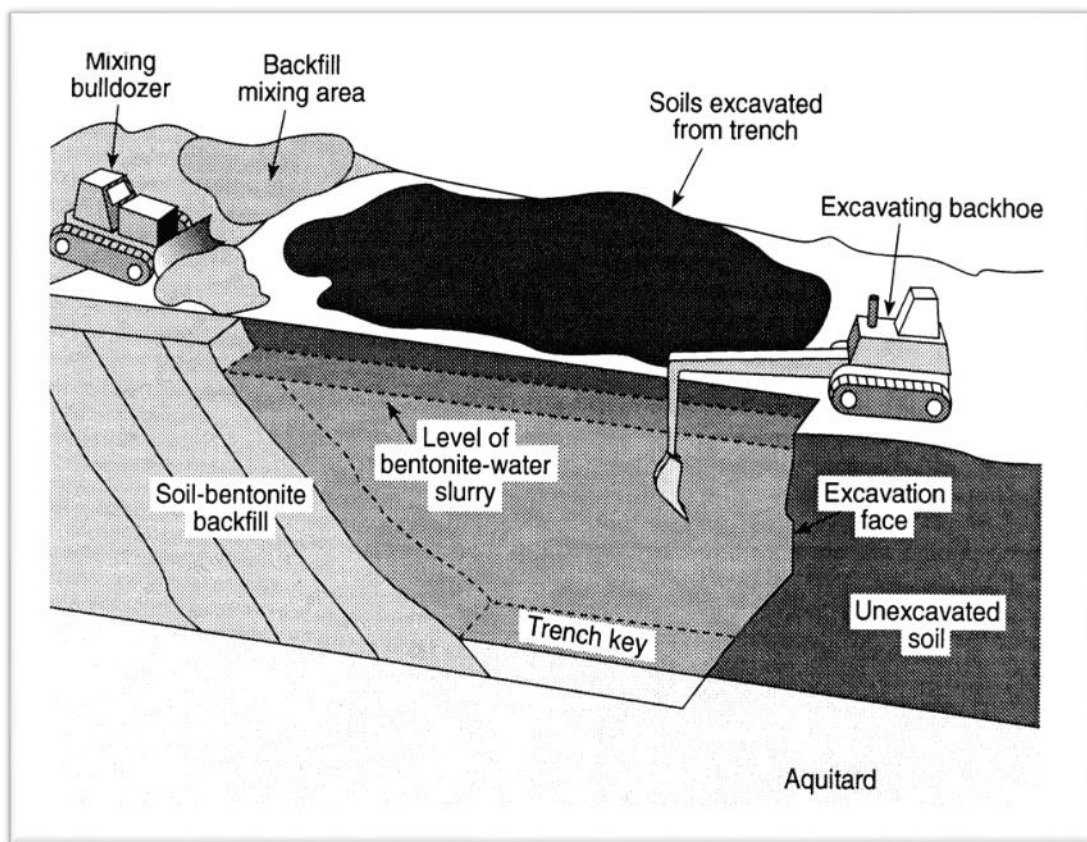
Soil-bentonite Cut-off Wall Construction Process (Evans, 1994)
